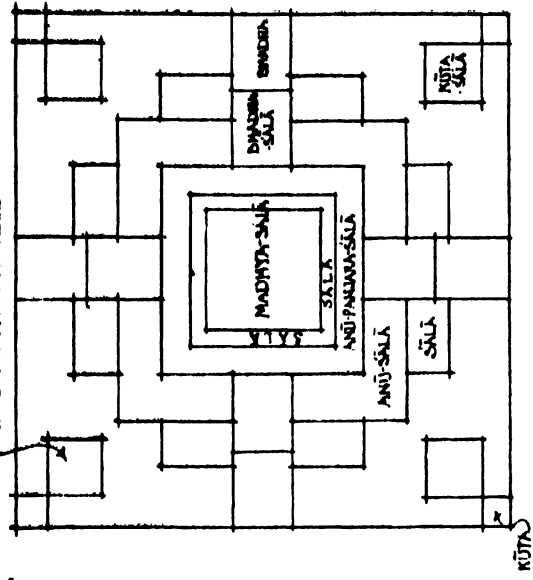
INTERMEDIATE SIZE — 50 PARTS
